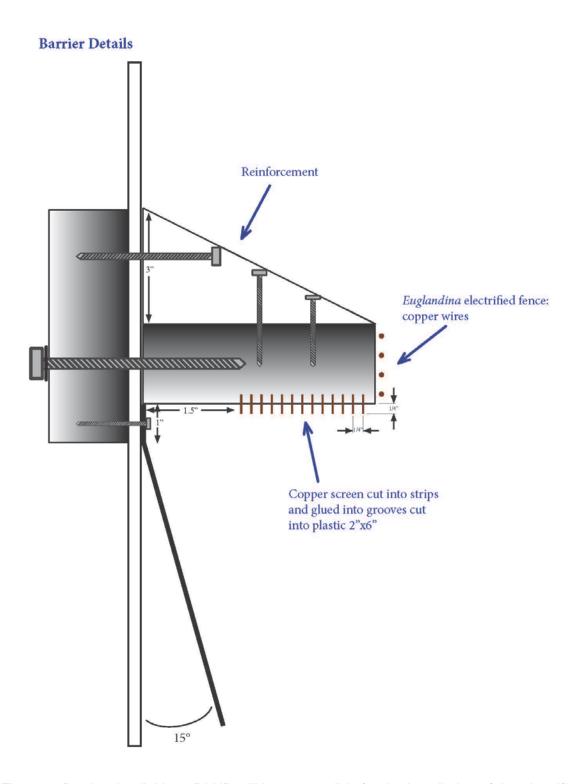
Barrier detail. Note, DLNR will be responsible for the installation of the electrified copper wires.
